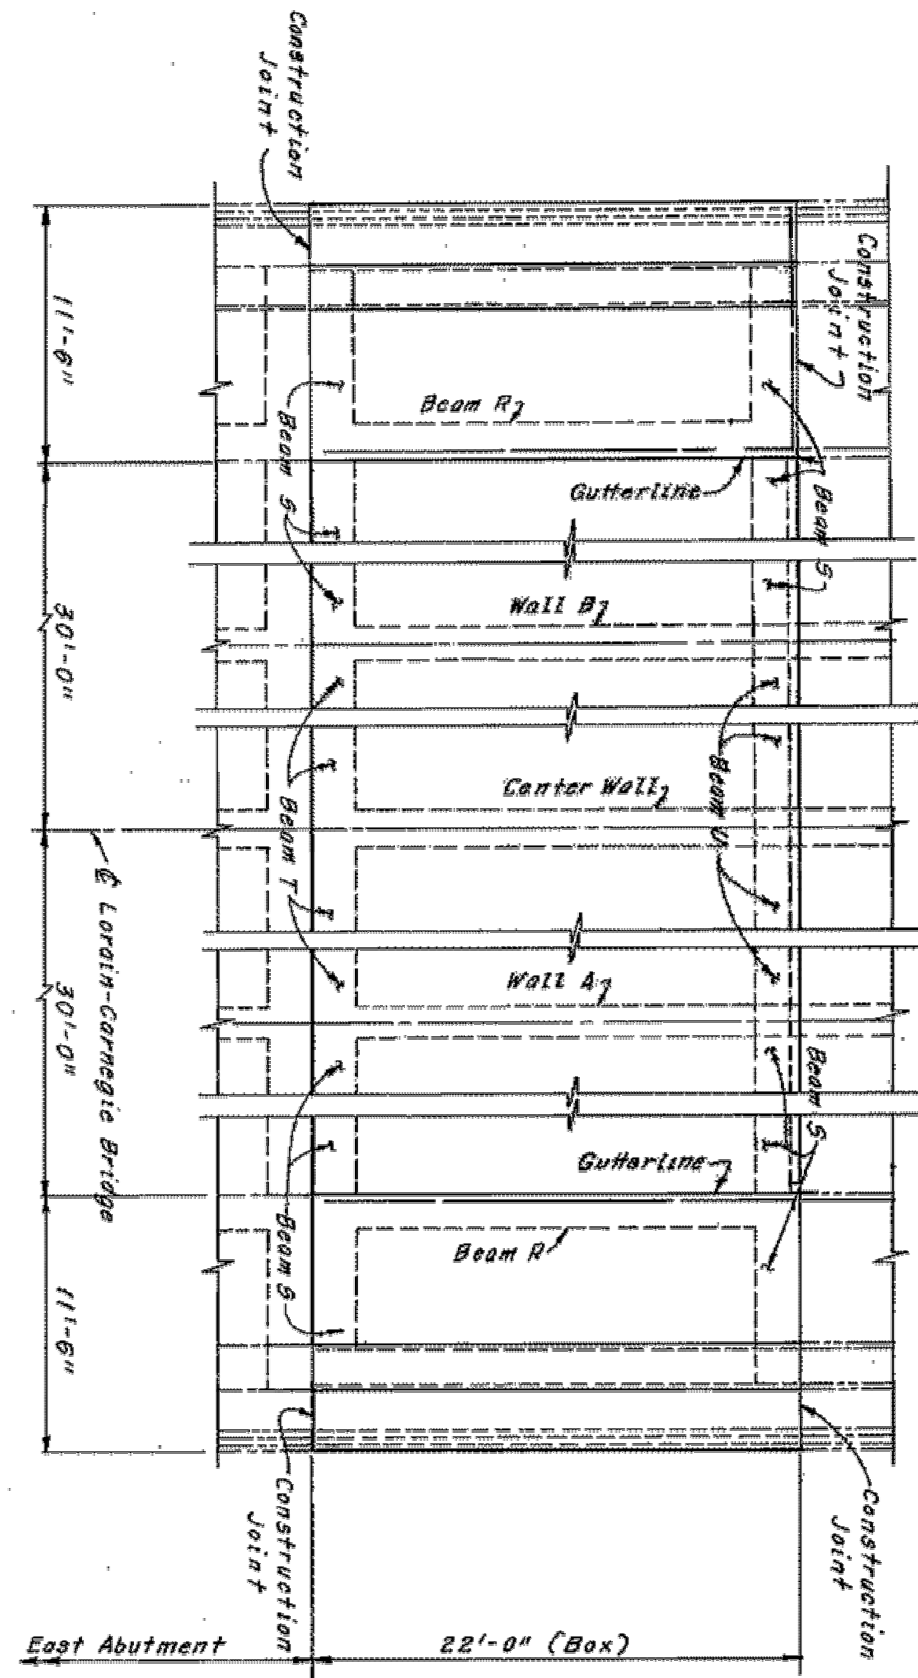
Partial Plan of East Approach Concrete Cellular Spans.
